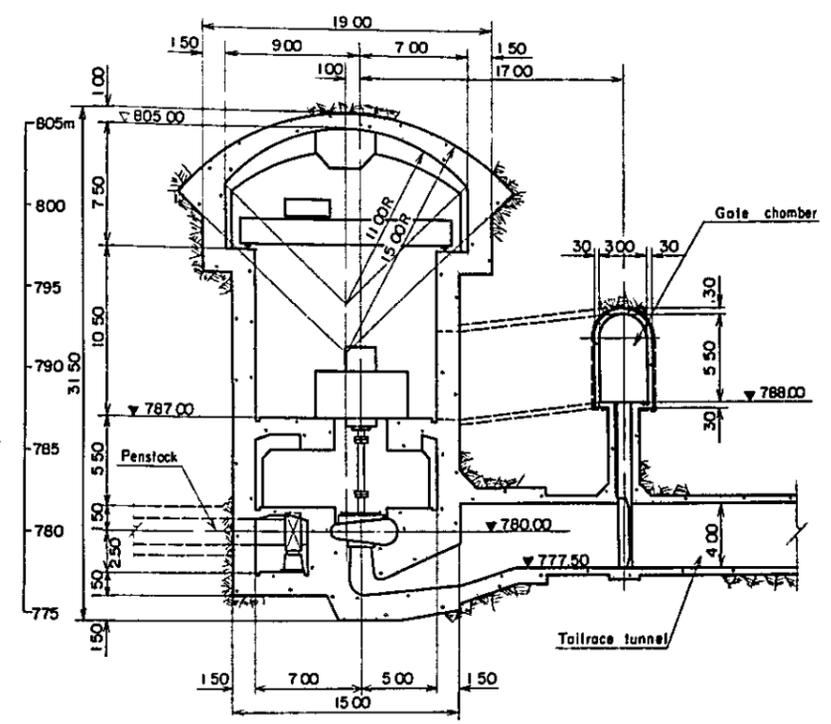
Surge Tank, Penstock, Powerhouse and Tailrace Tunnel (C-2), Profile and Section
